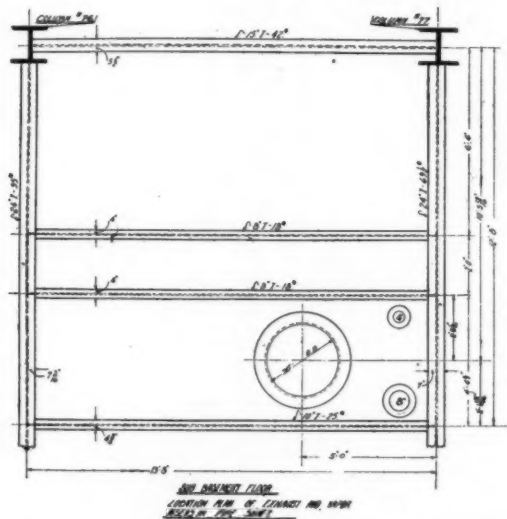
ARRANGEMENT OF RISERS IN PIPE SHAFT.
